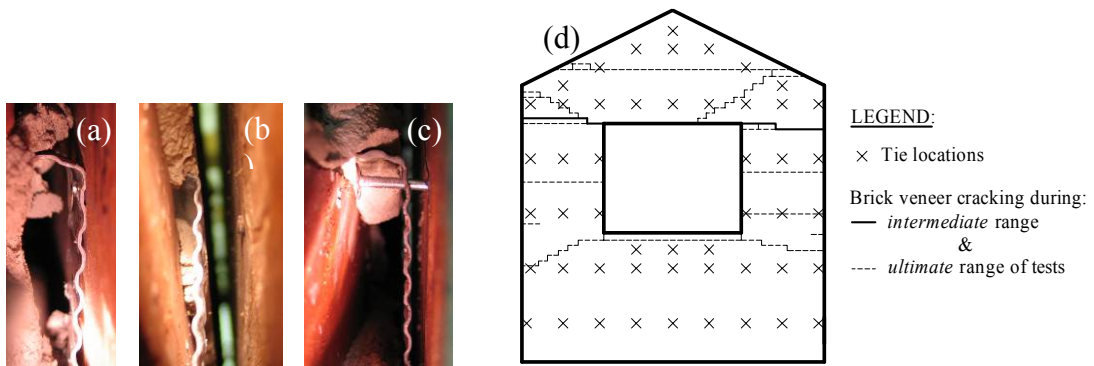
Typical damage at the tie connections, including: (a) onset of nail pullout, (b) broken nail head, and (c) major nail pullout. (d) Observed cracking patterns in the brick masonry veneer.
